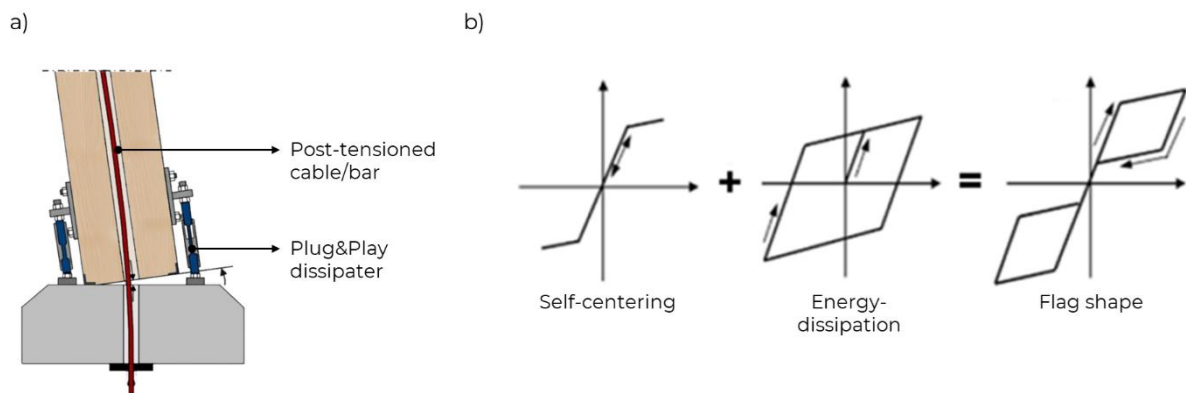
a) Example of a low-damage column-to-foundation connection, and b) hysteretic behaviour of the low-damage system considered (Pres-Lam), modified after fib [11].
